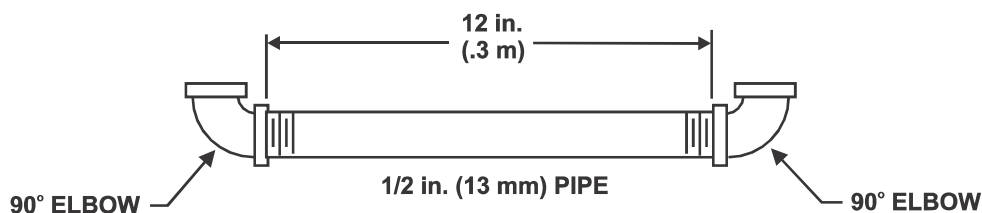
1/2 in. (13 mm) Piping with 90° Elbow
